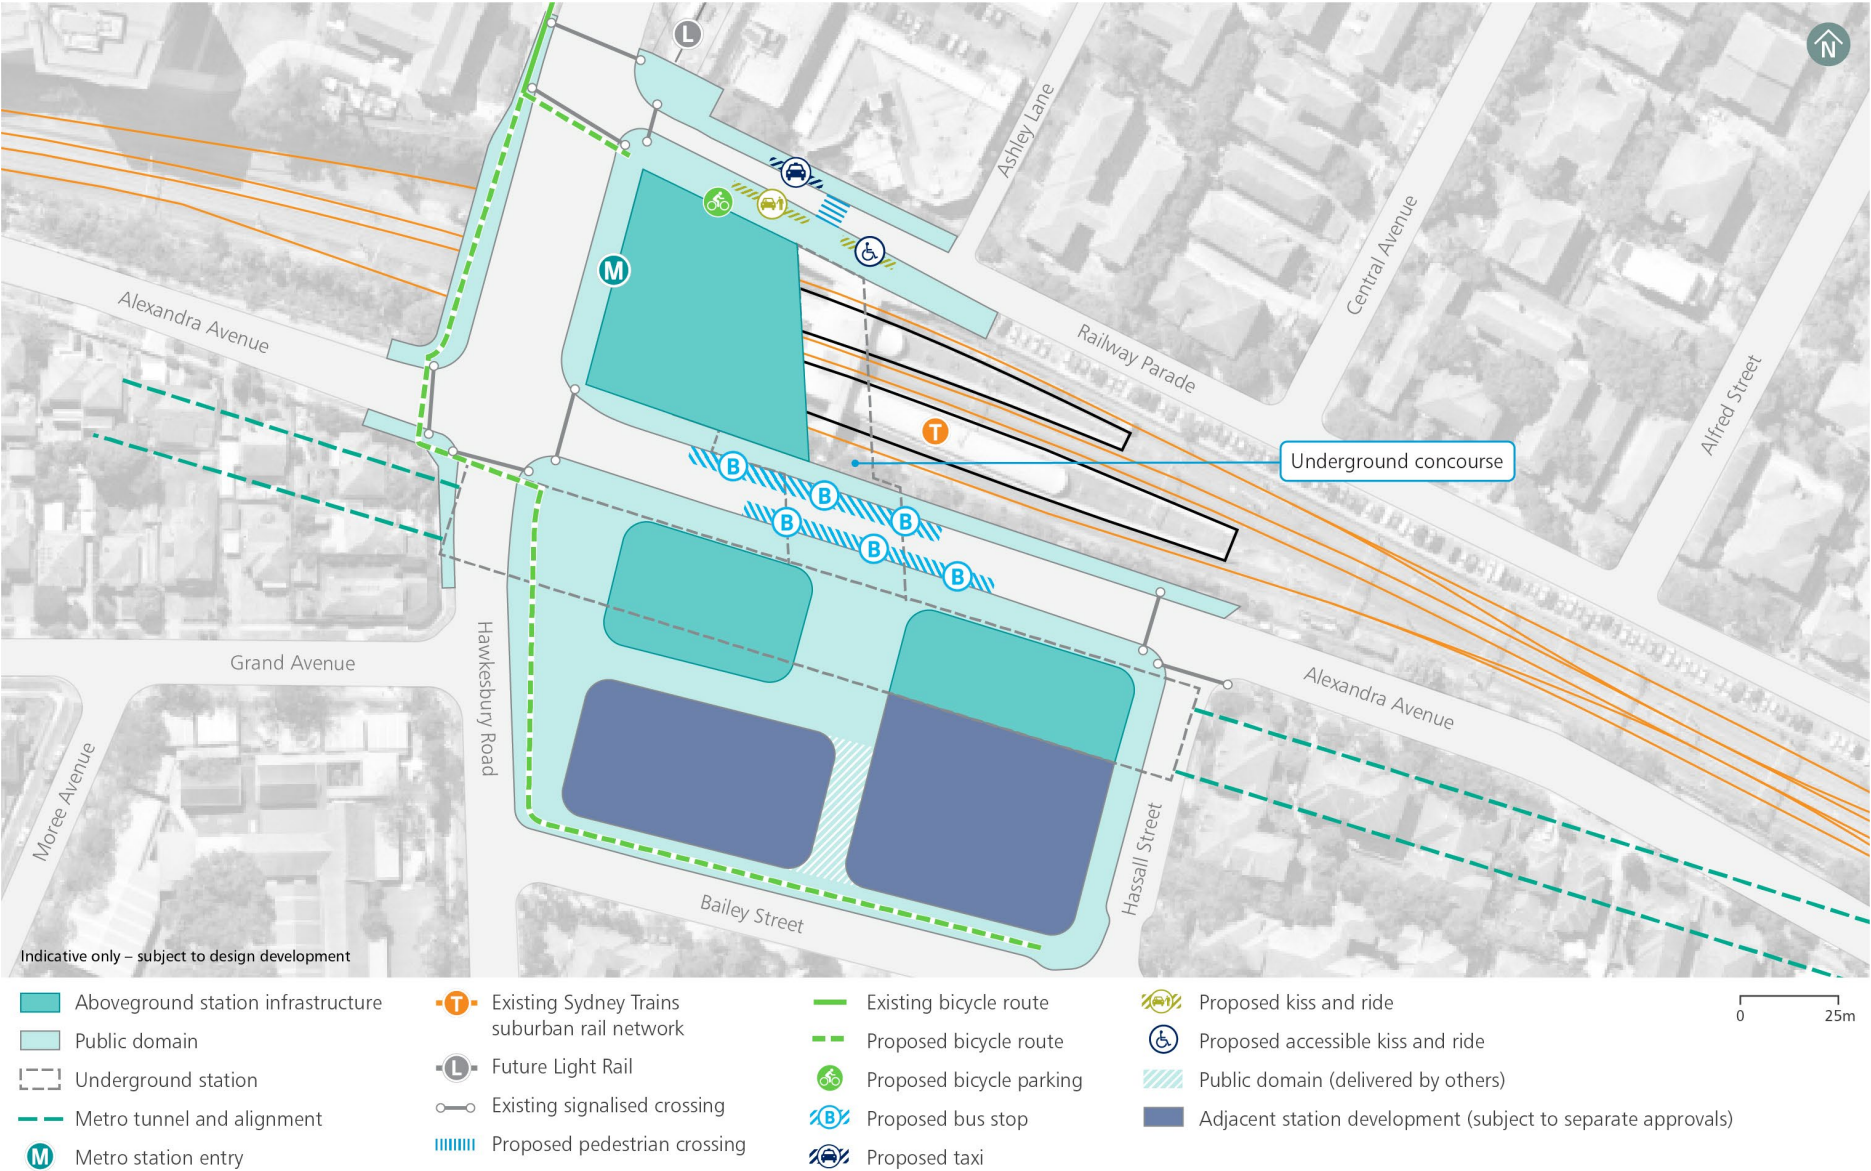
Indicative layout and key design elements – Westmead metro station
